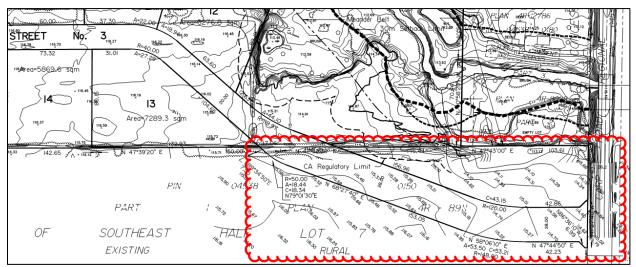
Excerpt from the revised Draft Plan of Subdivision showing the small realignment of Street No.: 3 to Carp Road. Note the small realignment has been emphasized with a markup by Novatech.
